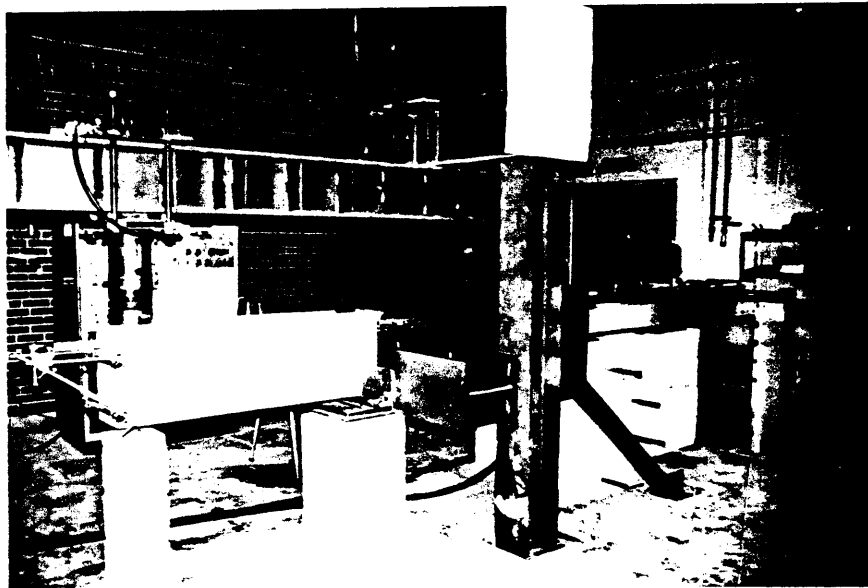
General View of Beam End Specimen Fatigue Test Set-up
